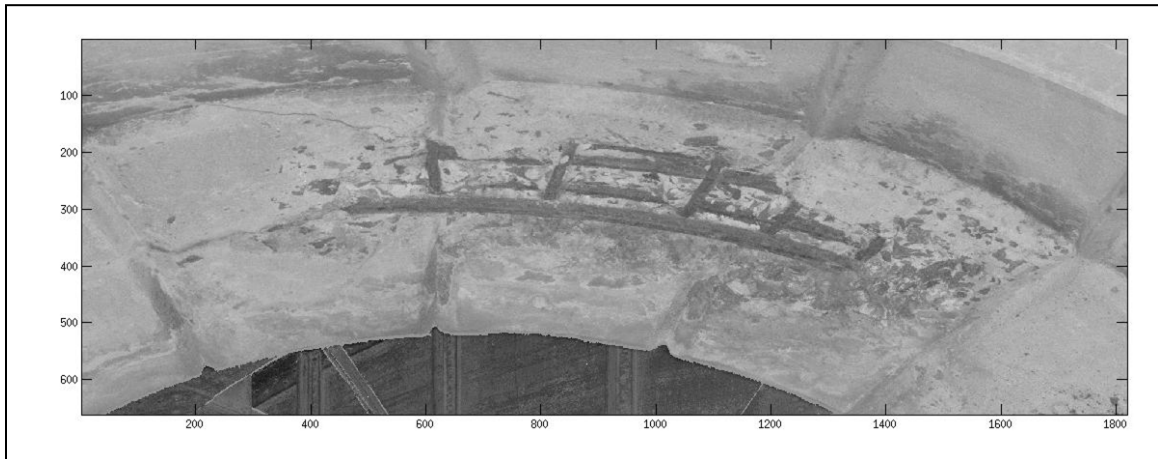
Tryon bridge with rebar exposure damage in the arc
